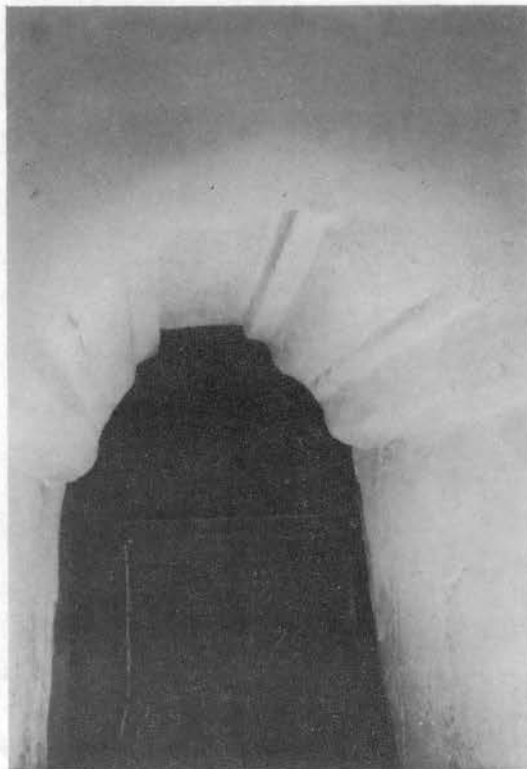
Ceiling Detail in Front of the Door Leading to the Staircase of the Right Tower.
